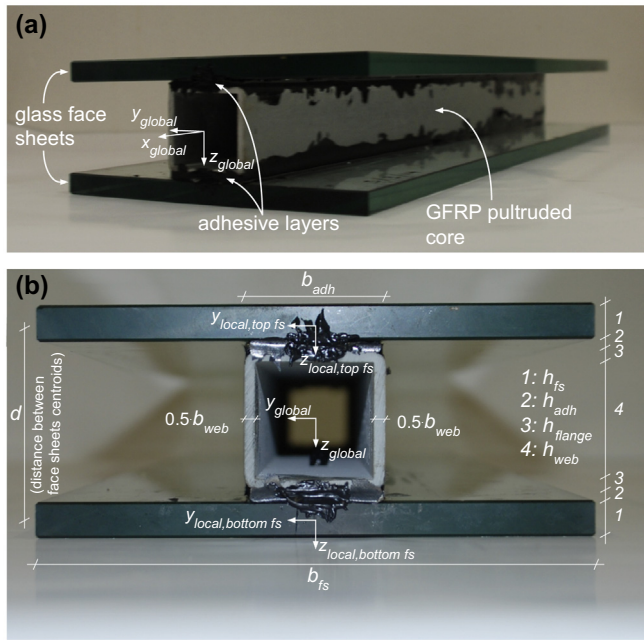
(a) General view and (b) cross-section of the proposed adhesively-bonded GFRP-glass sandwich beam referred in the following as GFRP-DP490-glass beam.
